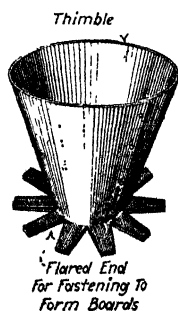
Thimble which may be used instead of the block shown in Fig. 299.
